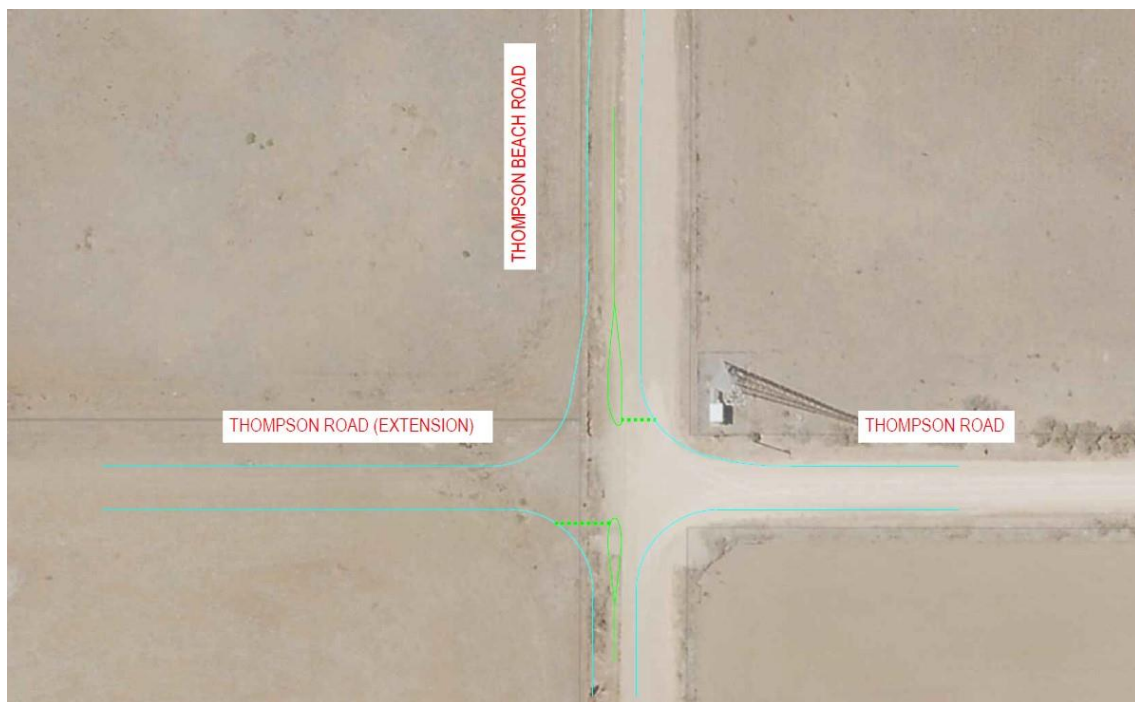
Concept design of intersection of Thompson Beach Road and Thompson Road
